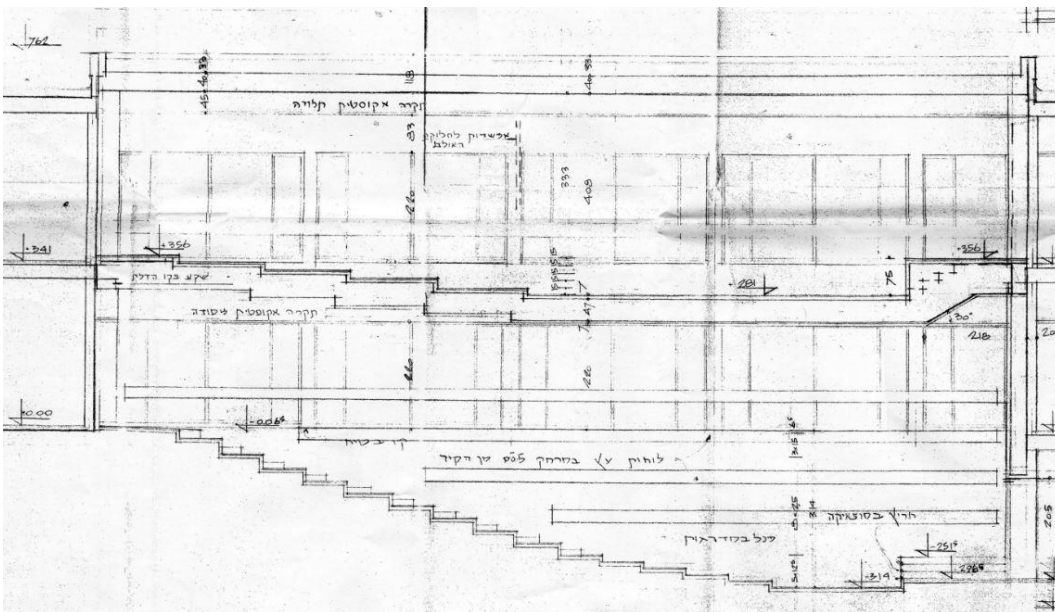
Gilman Building, original architectural plans, a detail of an east-west cross section of the southern wing showing a section through the central lecture halls
